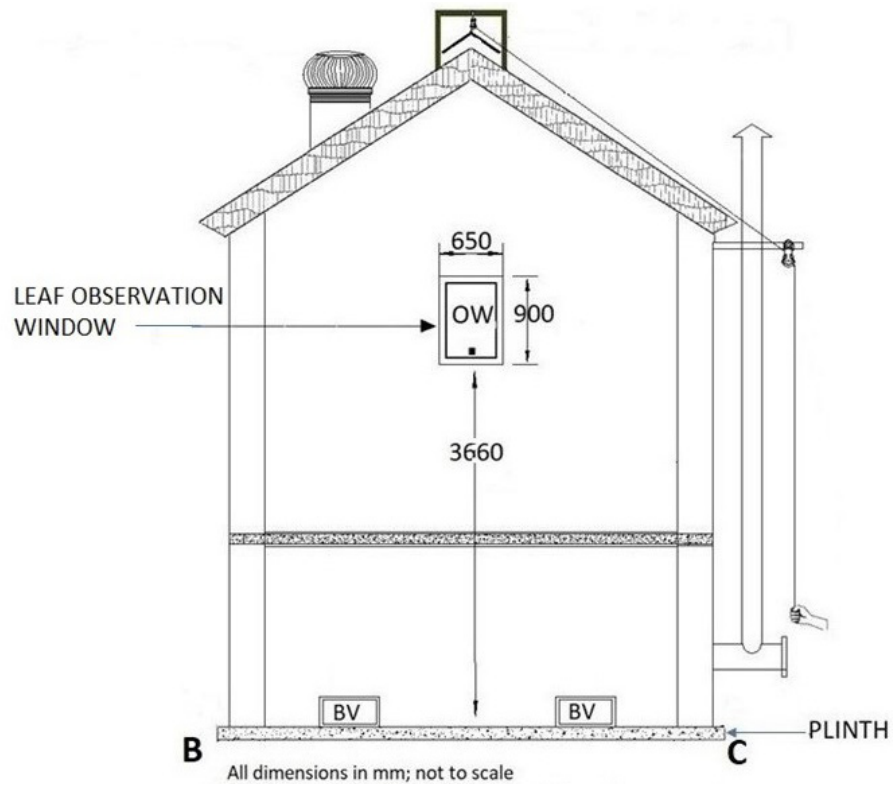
ELEVATION SIDE BC — BARN TYPE A
